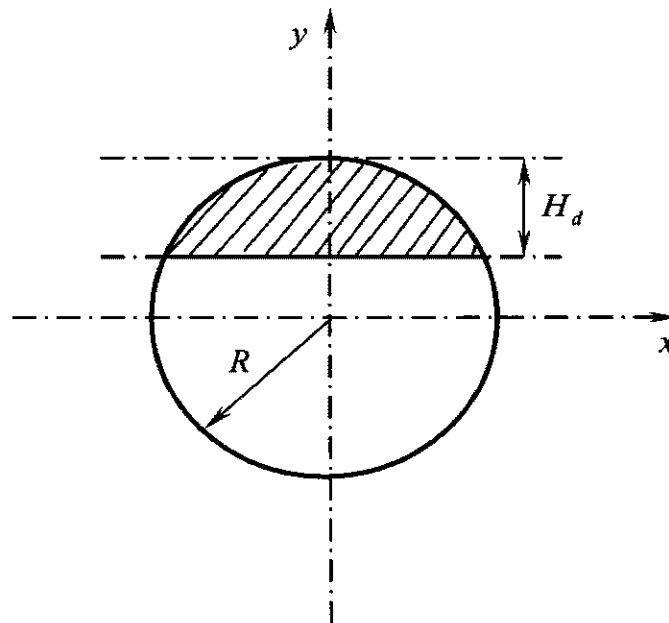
Circular cross-section (*shadow denotes the damaged area*)
